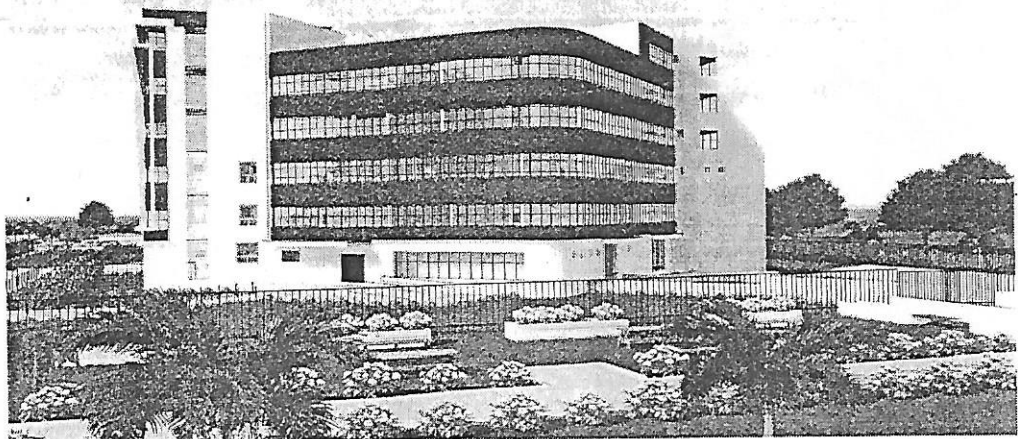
A view showing the application of defensive plantings, planter and fence as security measures in the proposed design.
